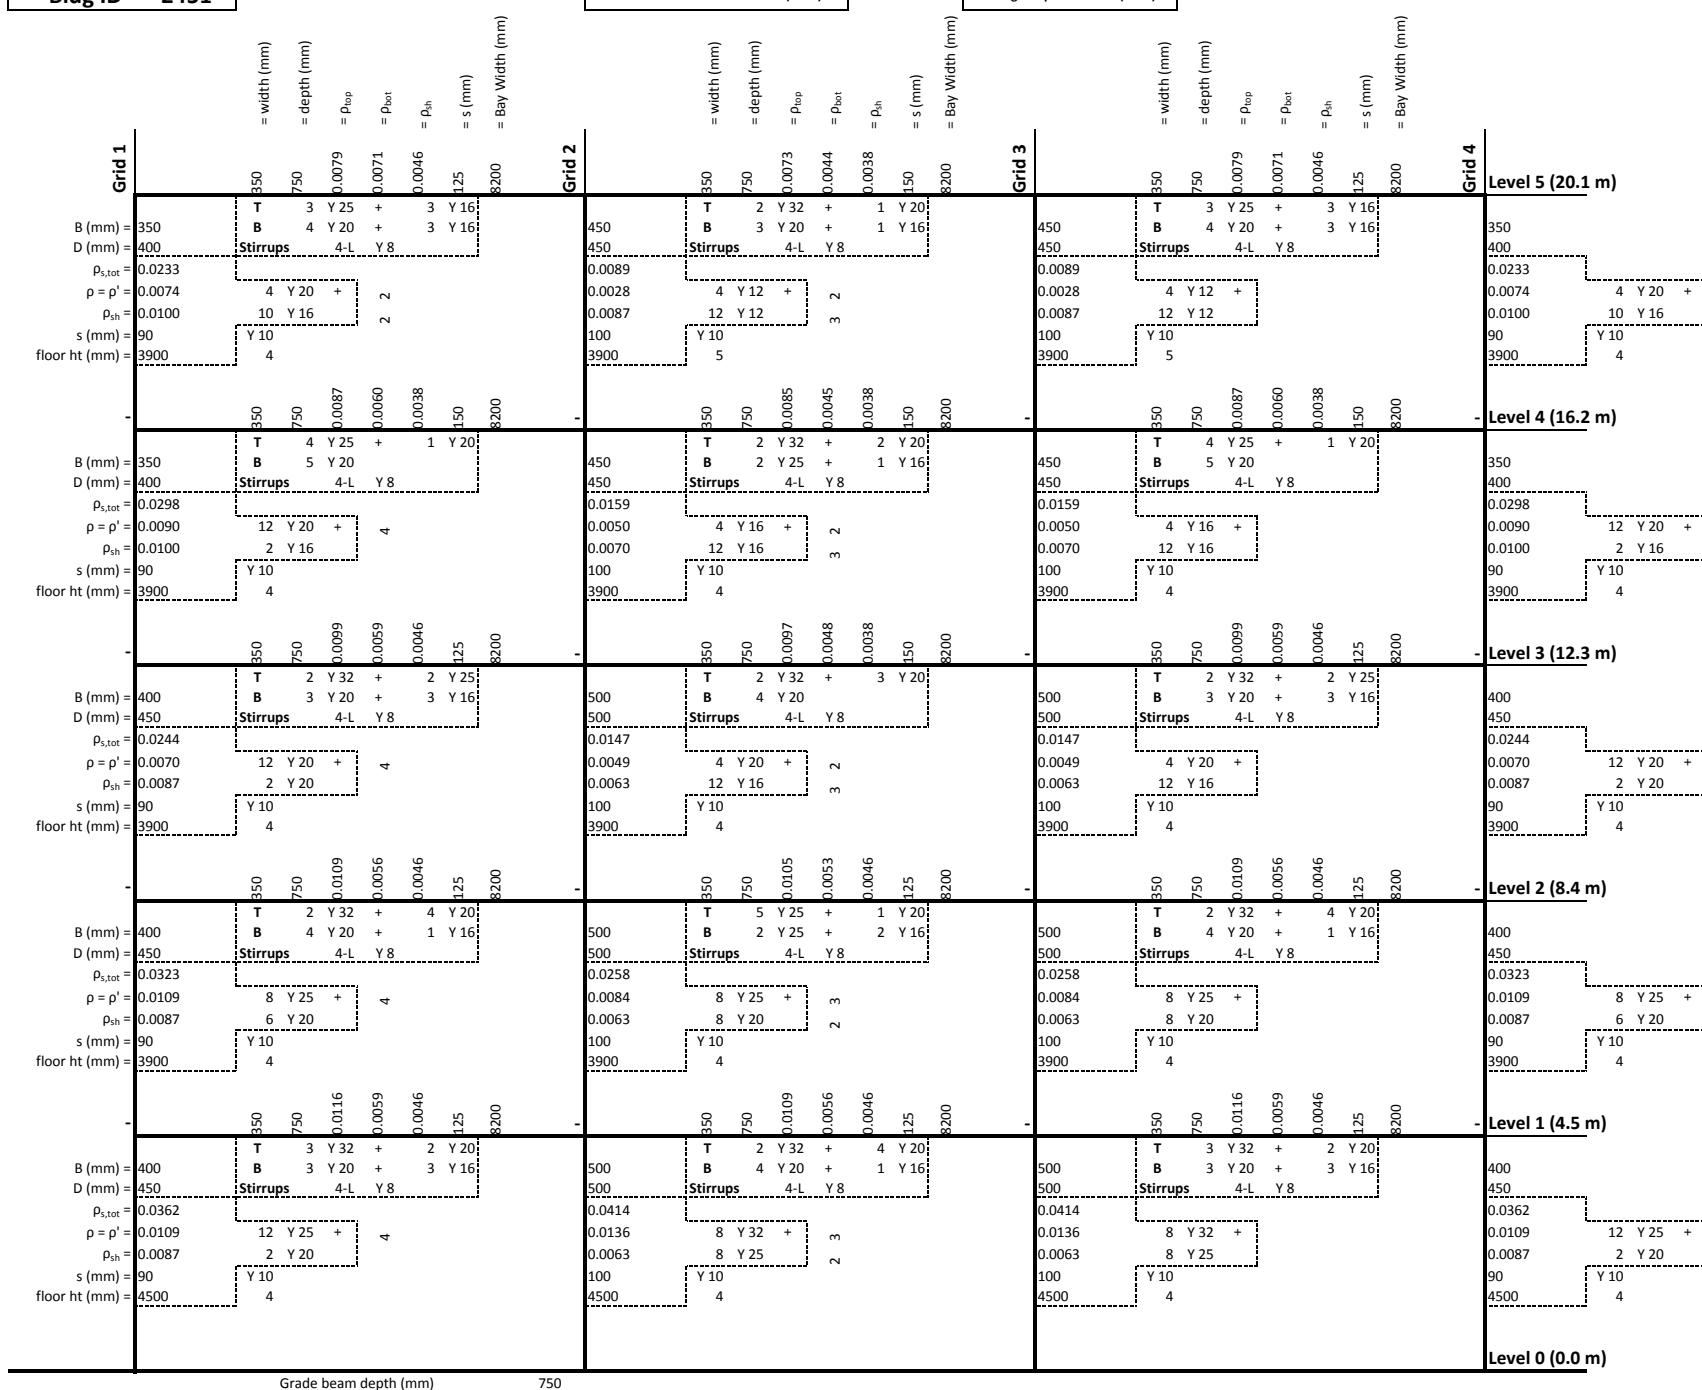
Provided reinforcement and modeling details for building ID 2451
